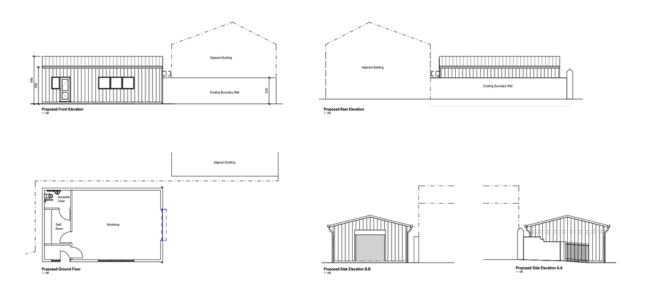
Amended Plans- elevations and floor plans reducing the proposed unit from 2 story to single storey
